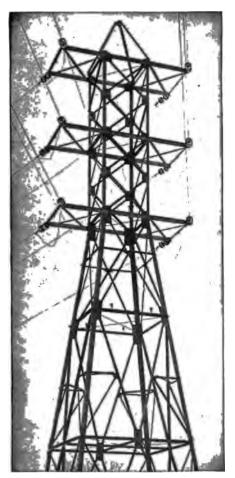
Angle tower showing General Electric strain insulators. The tower being subject to great tortional strains is creeted on a massive concrete foundation. The construction is similar to the standard tower but of heavier material, and having the same vertical dimensions but with bases 201t. aquare.
